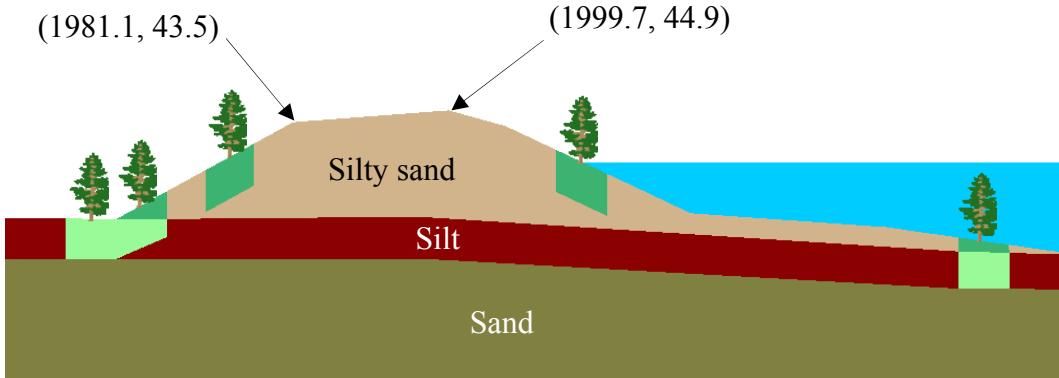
Cross section with material types and tree placements for levee in Burlington, WA
